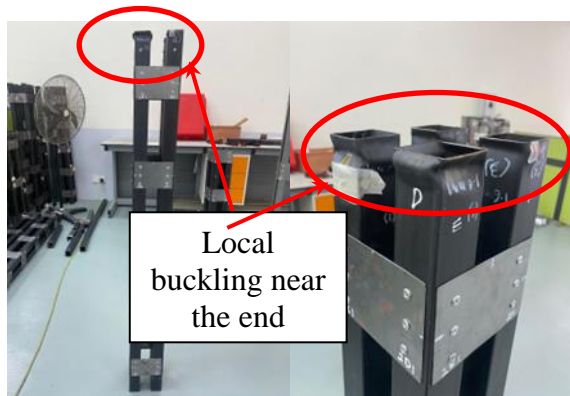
Failure modes for specimen CFS built-up batted column with SHS of S2-H2-B300
